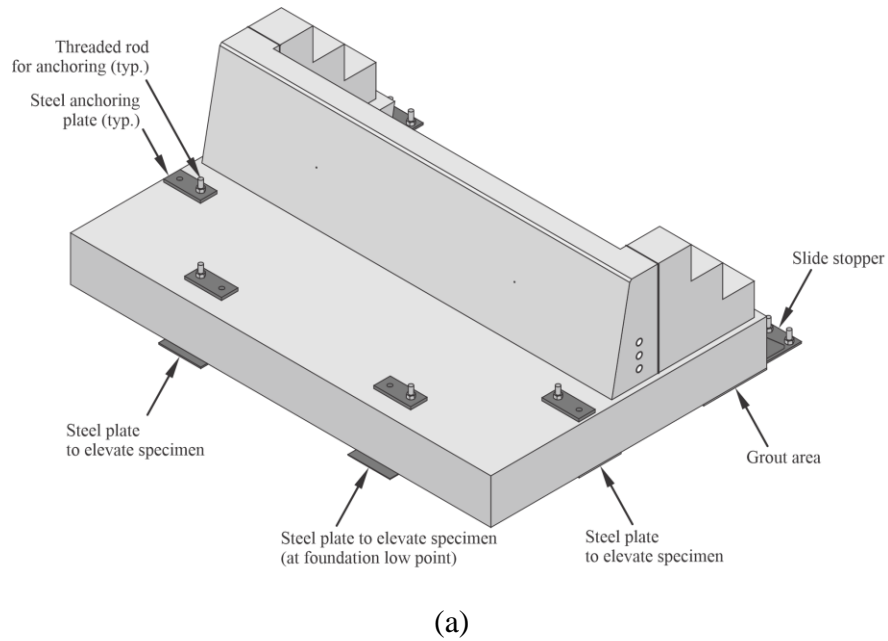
Diagram of impact test specimen with additional anchoring elements placed:
